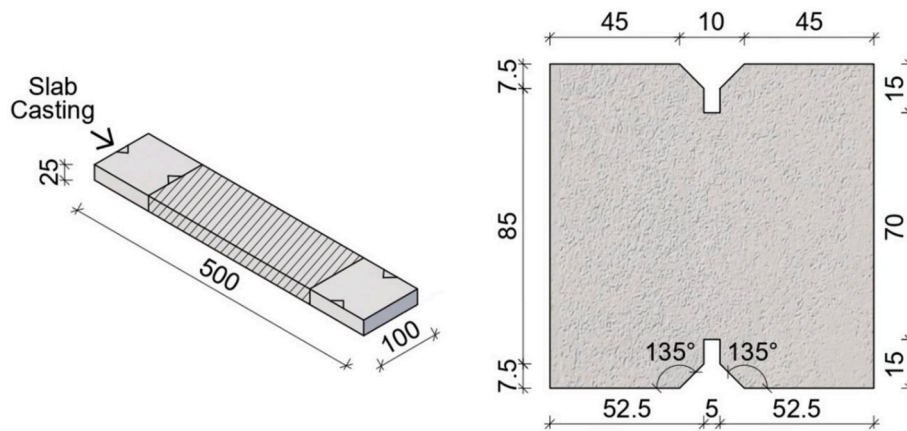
DEWS specimens cutting from thin beams and detailed geometry (dimensions in mm).
